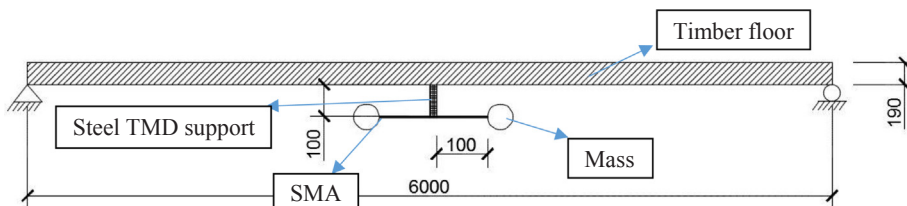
Timber floor using tuned mass damper by bending SMA (unit: mm).
